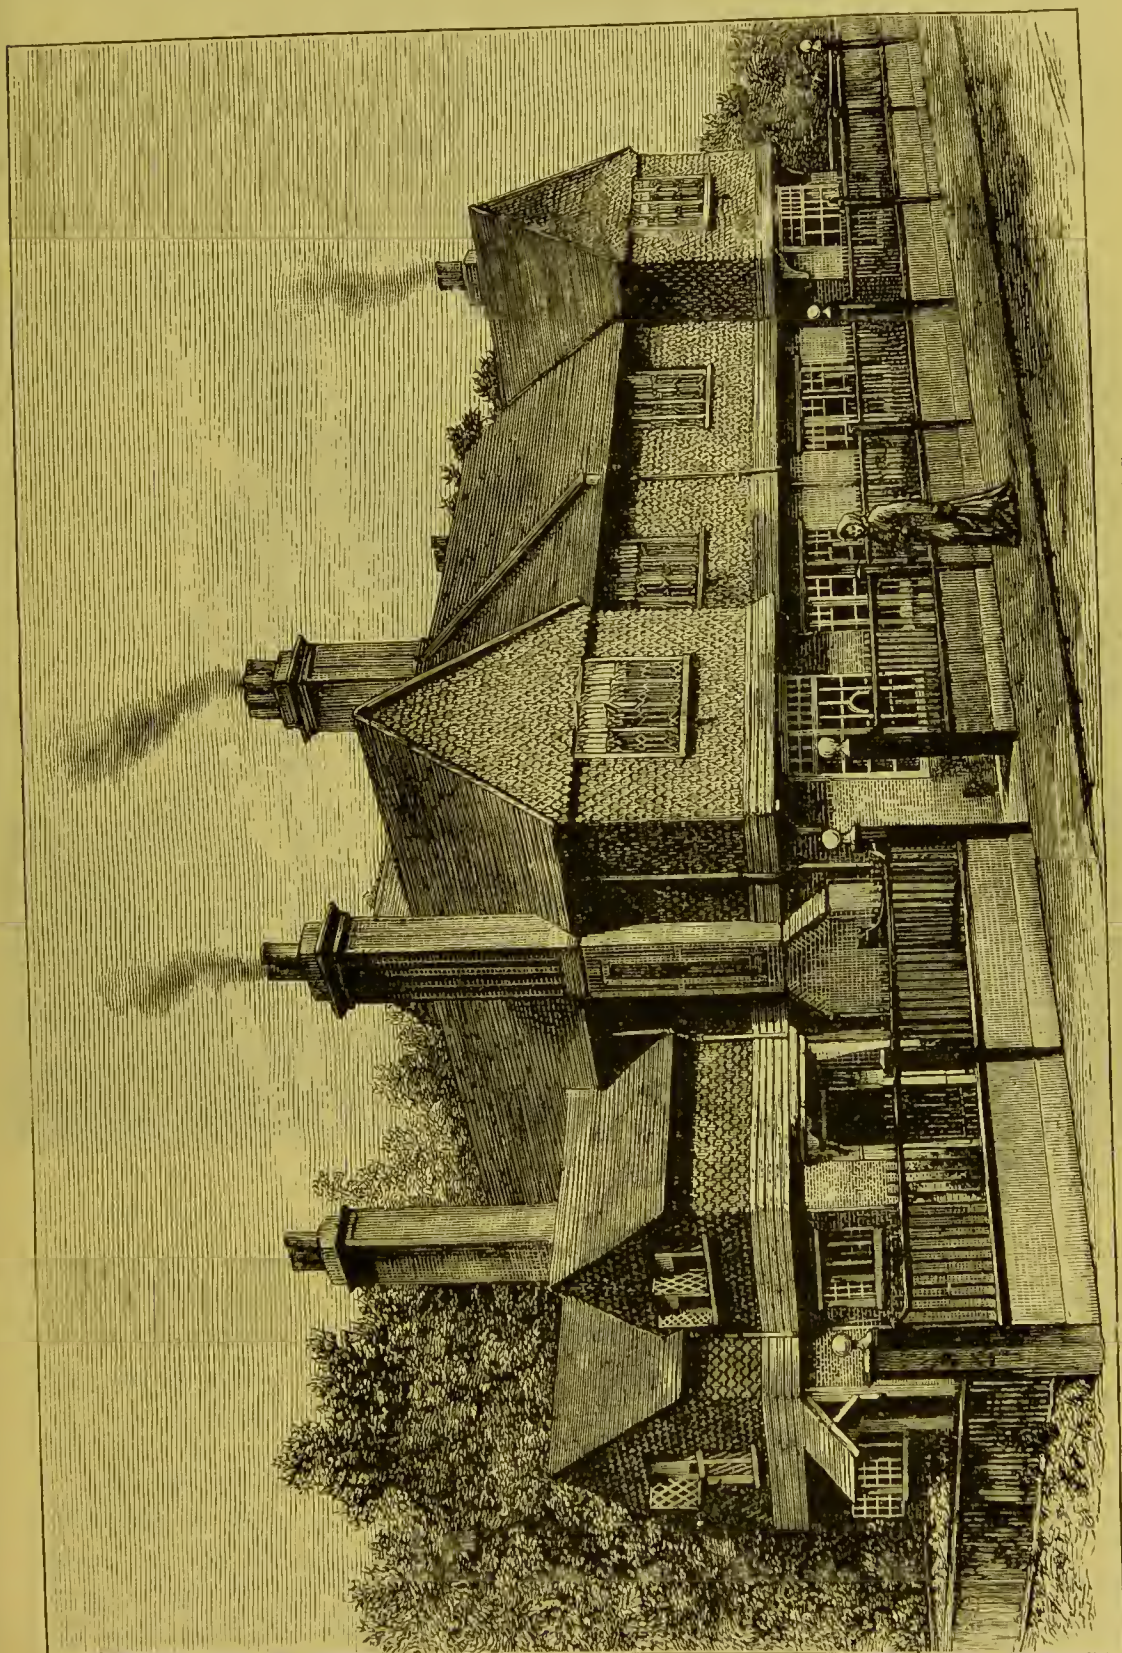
PAIR OF COTTAGES BUILT WITH CONCRETE ON MR. LASCELLES' SYSTEM.
